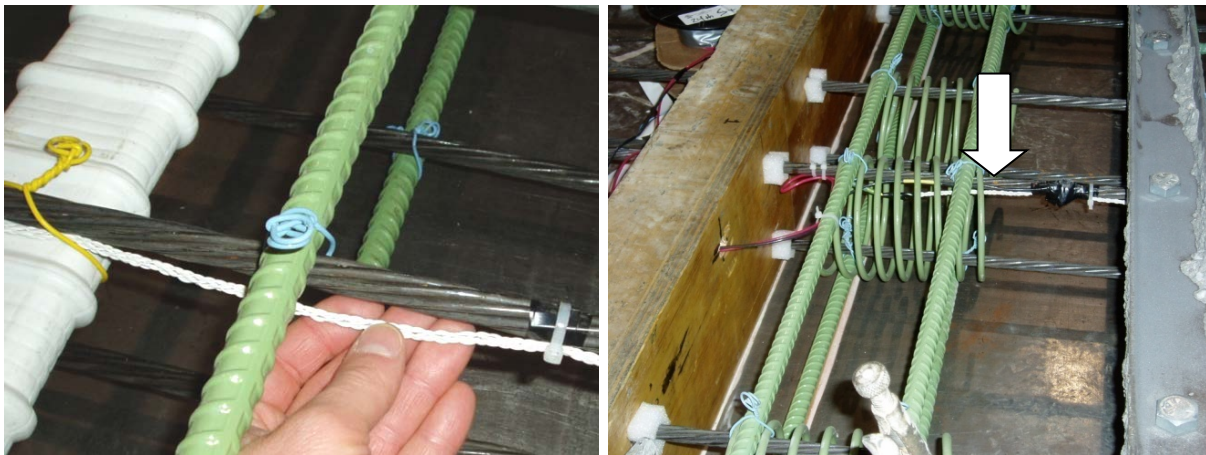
Corrosion sensors installed in a panel before casting.
